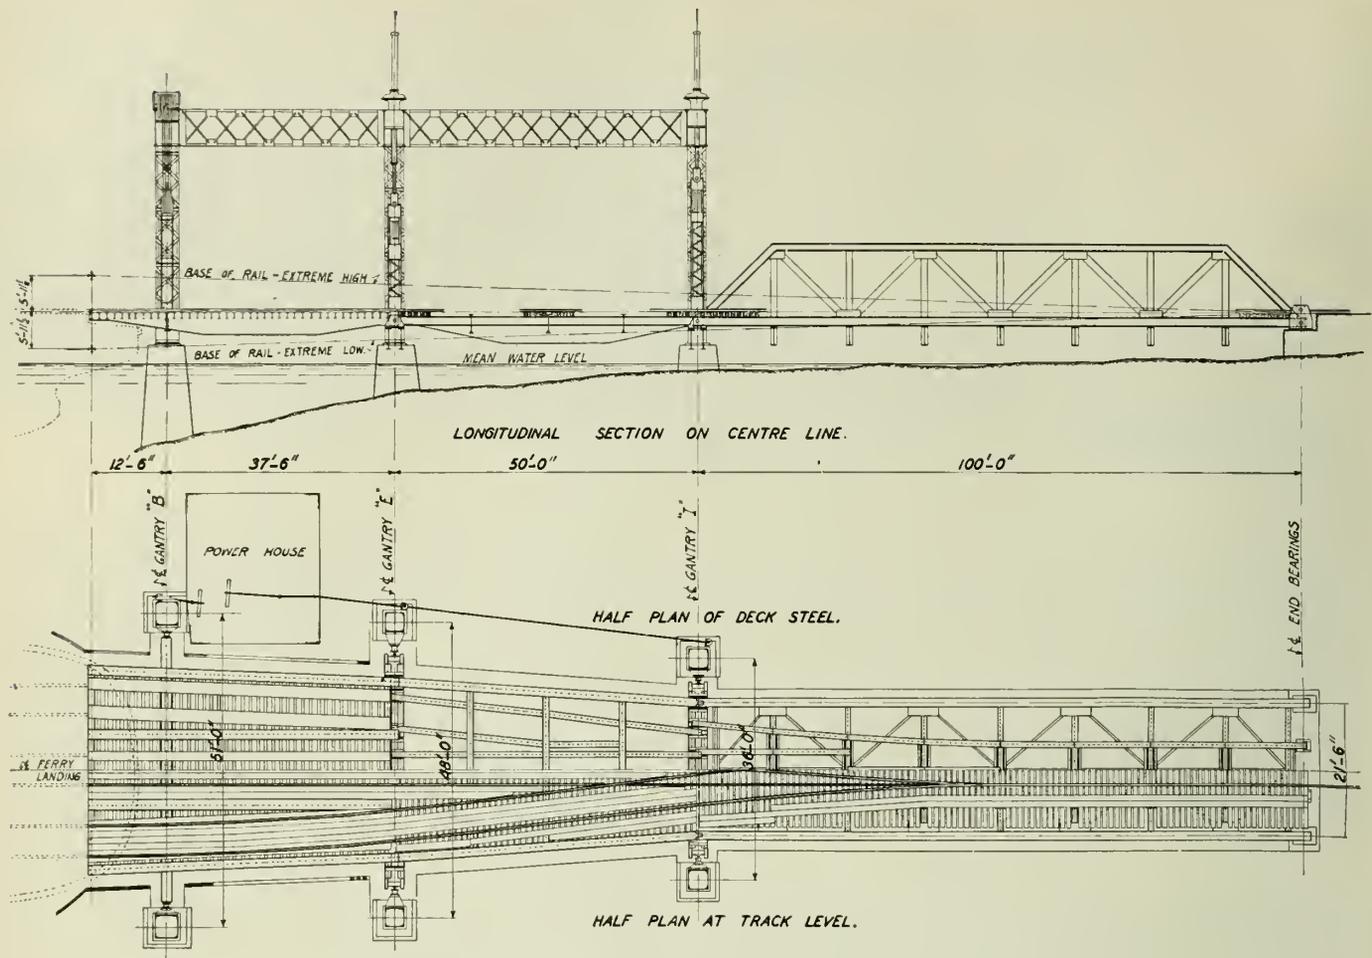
Plan and Longitudinal Section through Ferry Landing.
